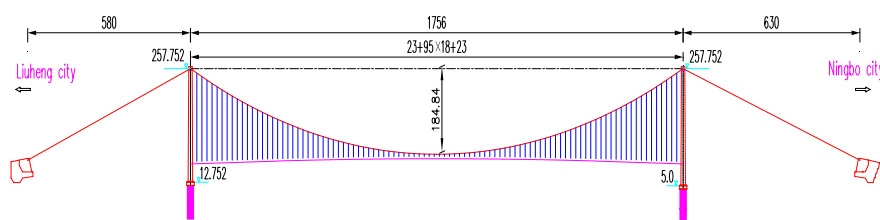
Structural layout of the suspension bridge (Unit: m)
